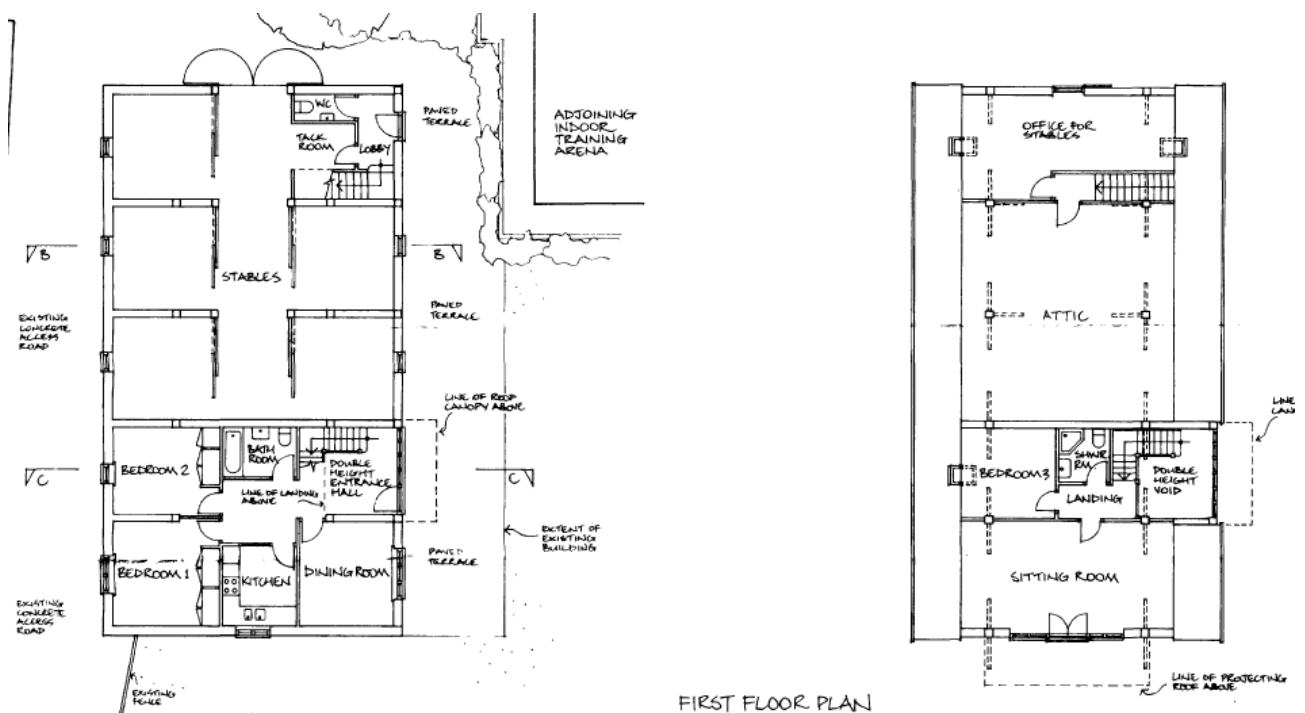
floor plan as approved (Y00/0545/SH & Y12/0337/SH)
